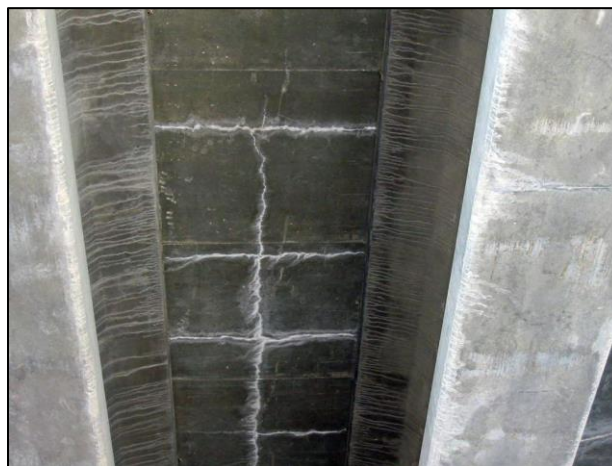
1F 429 Deck Underside Inspection Photo (UDOT 2006)
